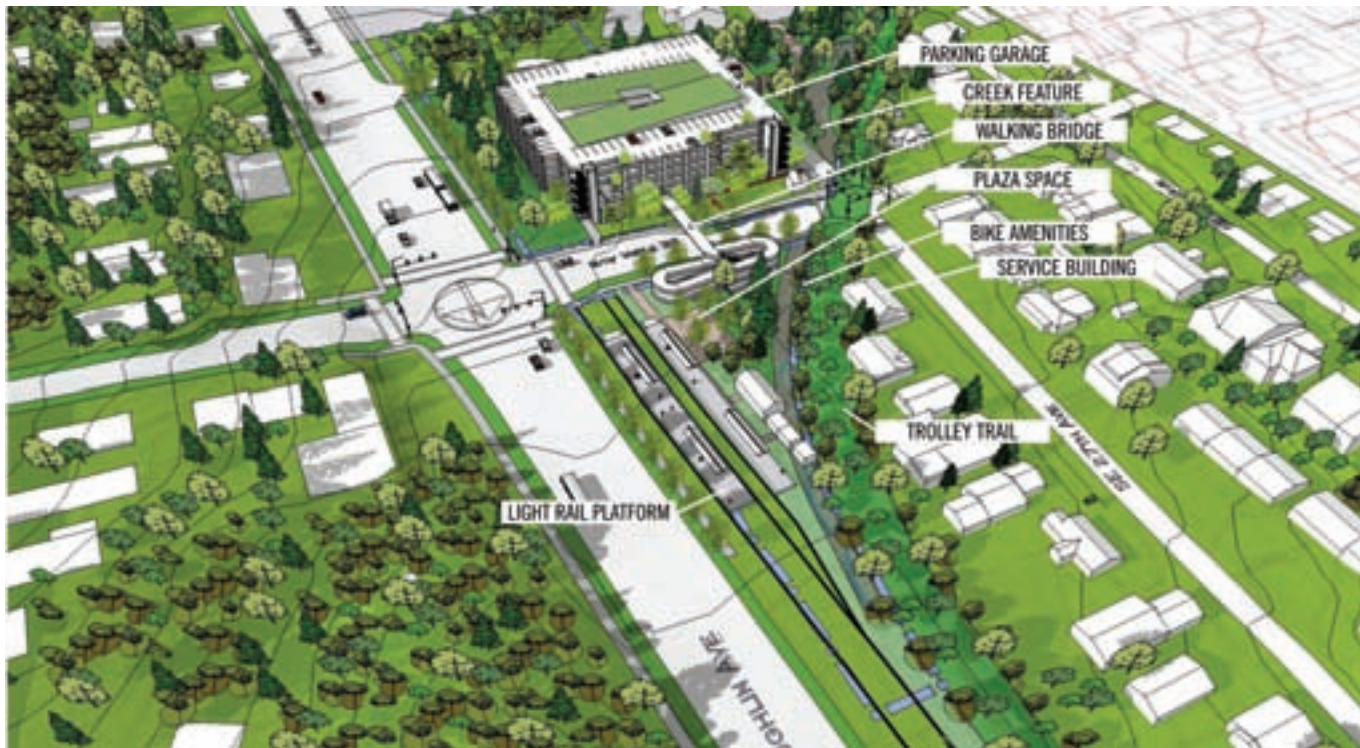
Conceptual illustration of the Park Avenue Station and Park & Ride garage, as viewed from the northeast
